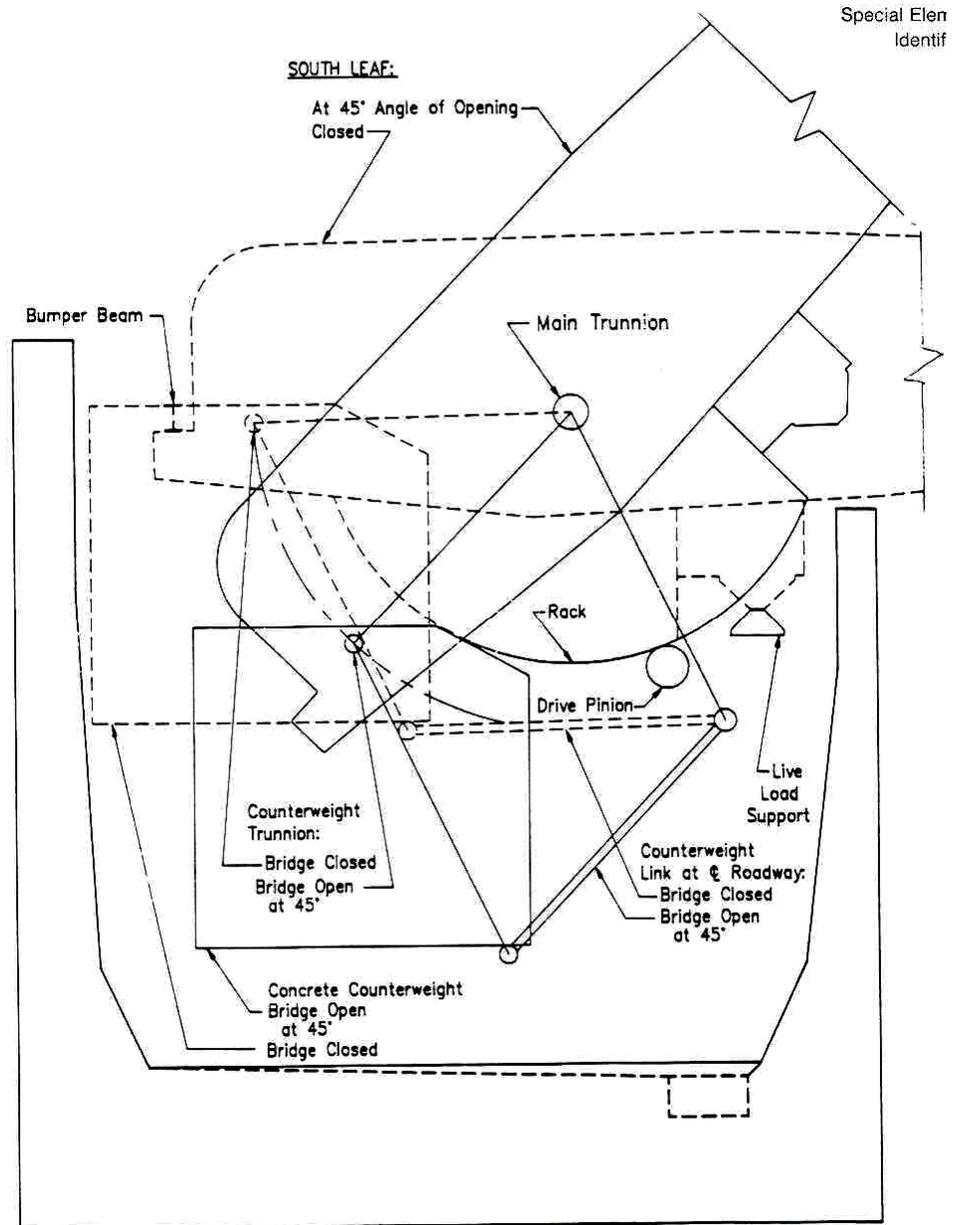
Multi-Trunnion, Strauss Type Bascule Bridge
